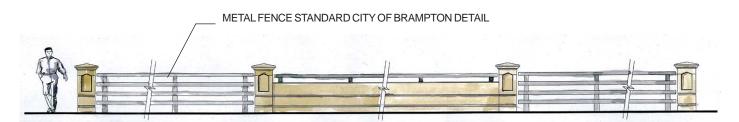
Bonnie Braes Drive - valley crossing street elevation.
